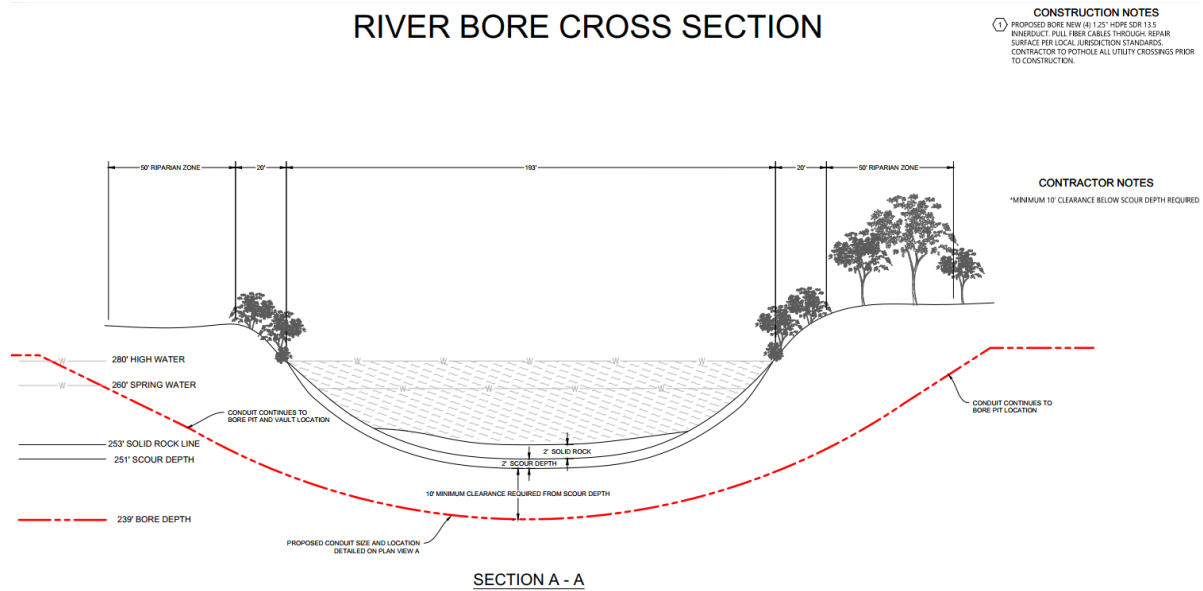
Directional boring detail for typical waterbody crossing. It is typically installed 10 to 15 feet below thalweg or scour depth and is offset at least 50 to 75 feet from the edge of the bank.
